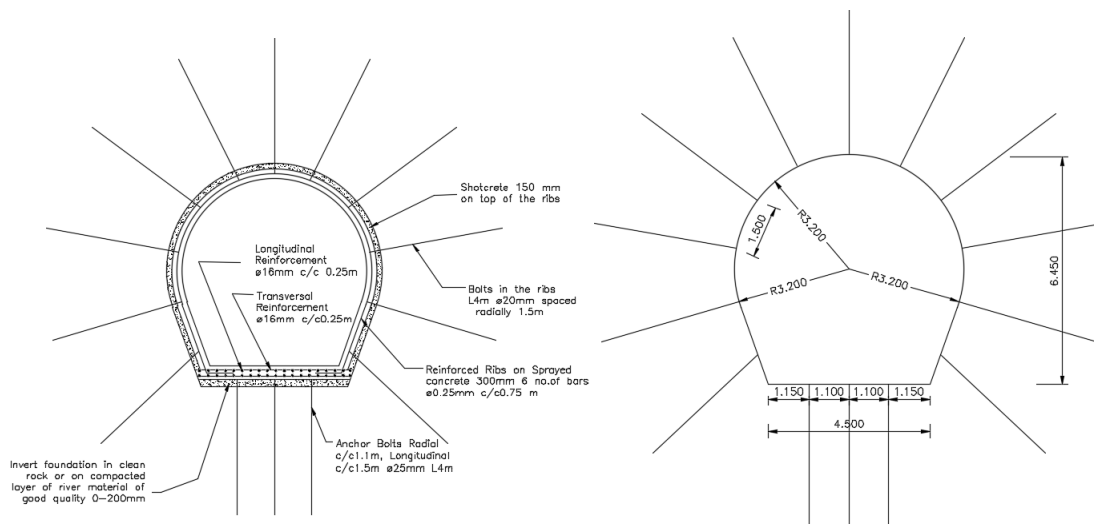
Installed Support at Moglice head race tunnel at the section containing flysch rock (left) and Tunnel cross section used for the modeling (Right)
